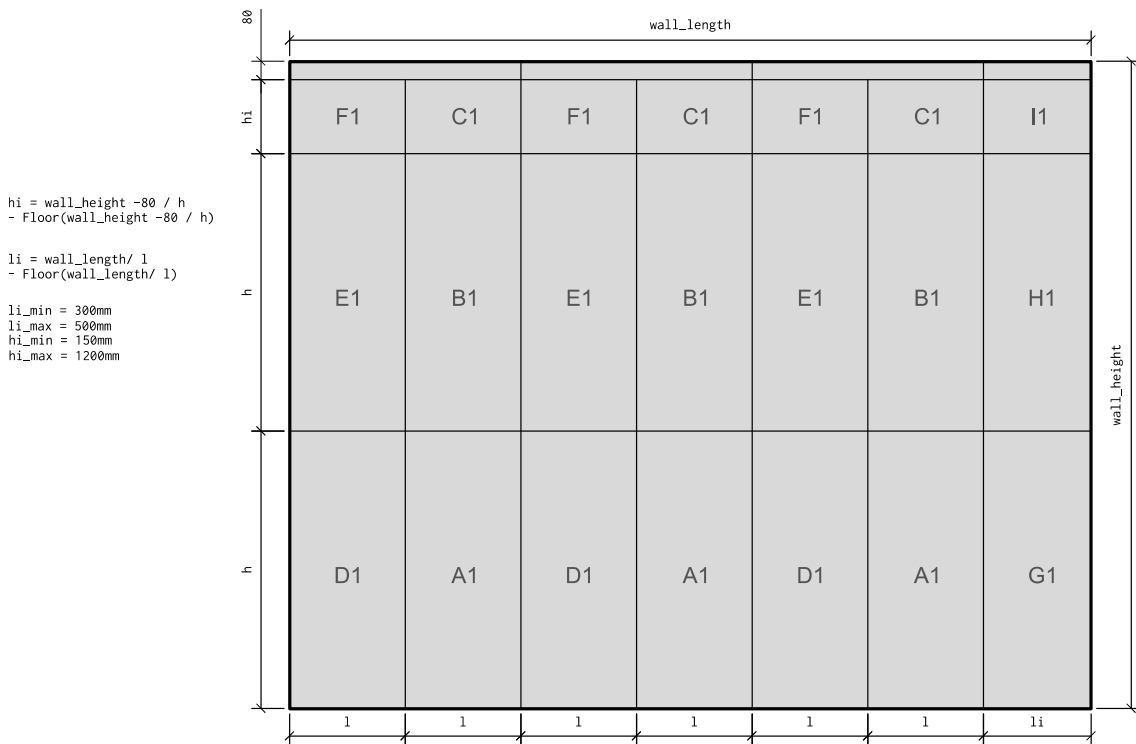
ORW v3.2 typical elevation with metric dimensional subdivision and functional subdivision
